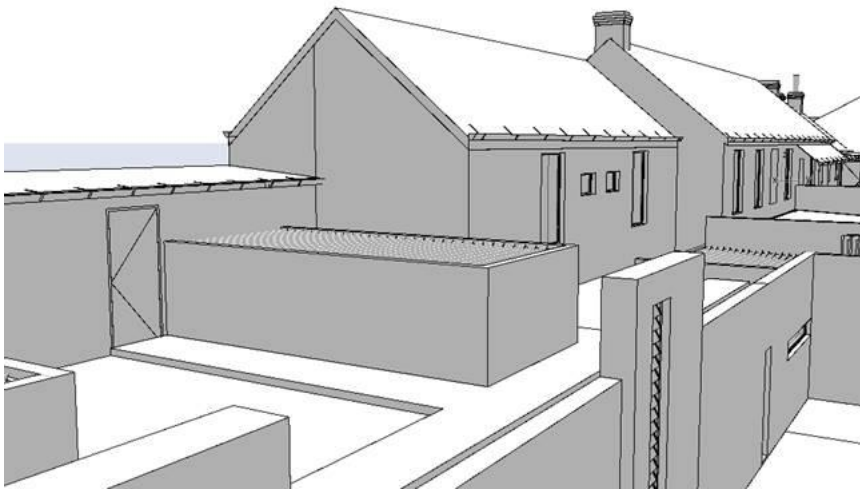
Architects illustration of recommendation for upper roof extension, allowing part of the original gable, apex, and chimney to be 'read'.
